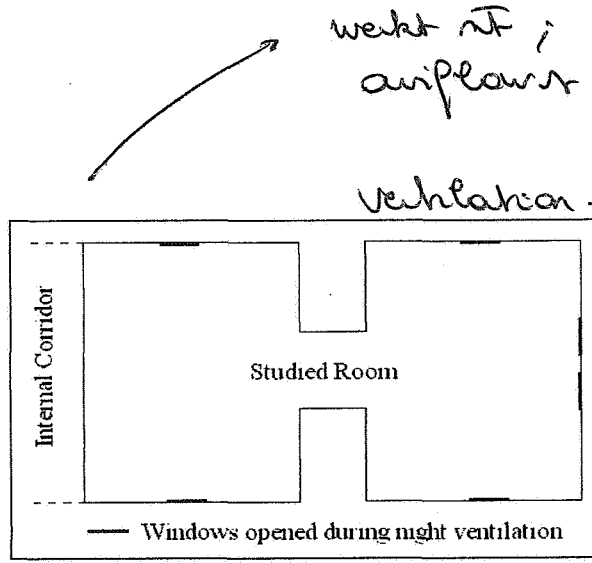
Plan of the office located in "National Observatory of Athens" building, showing the location of the studied room.
